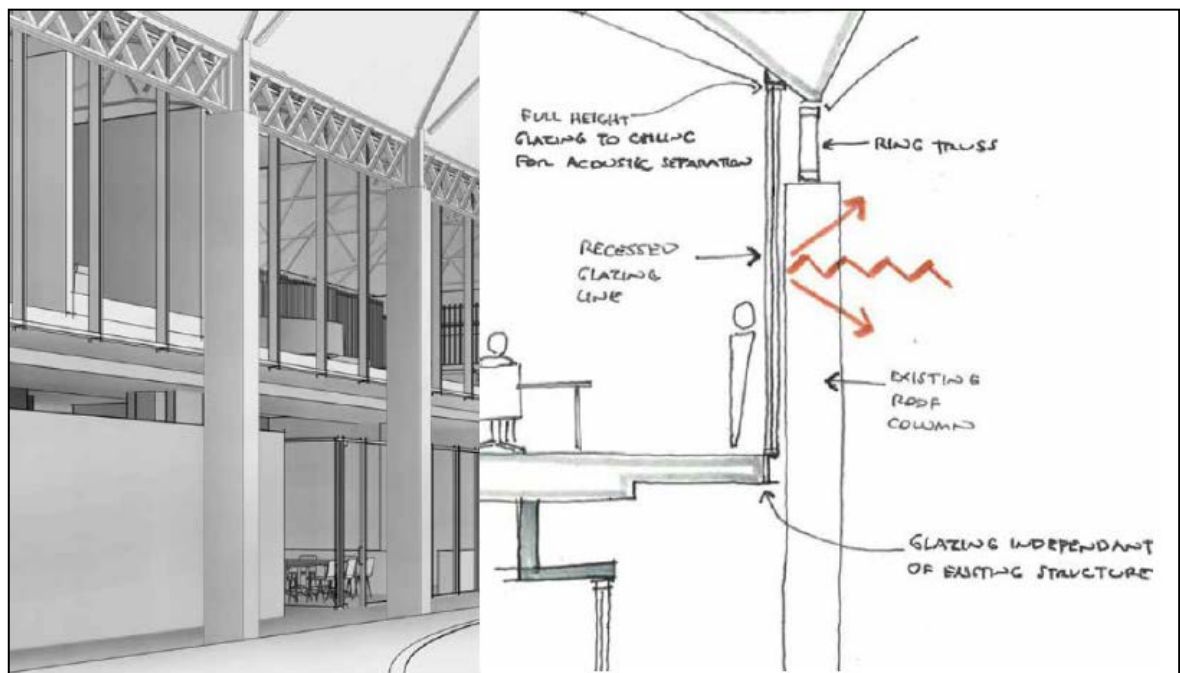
| Images showing setback of internal walls and glazing from original columns (Source: Applicant's Design report).
